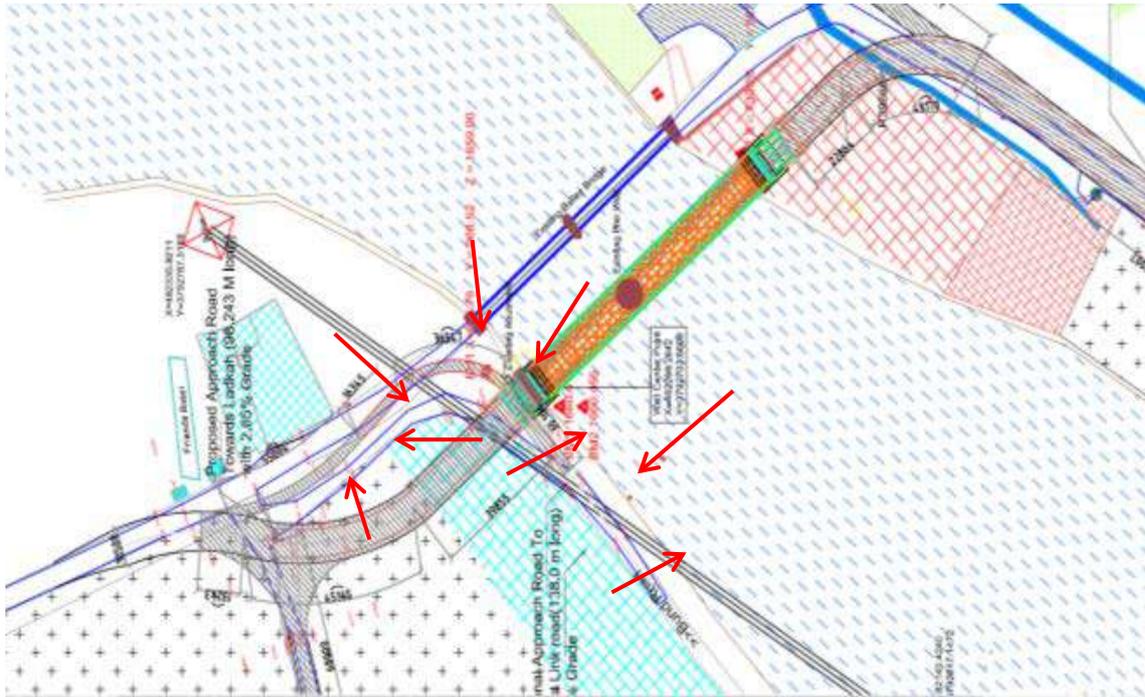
Schematic layout plan (red arrows) showing the proposed “Safe Access Route” for the Stone Crusher Unit and Hollow Concrete Brick Unit
